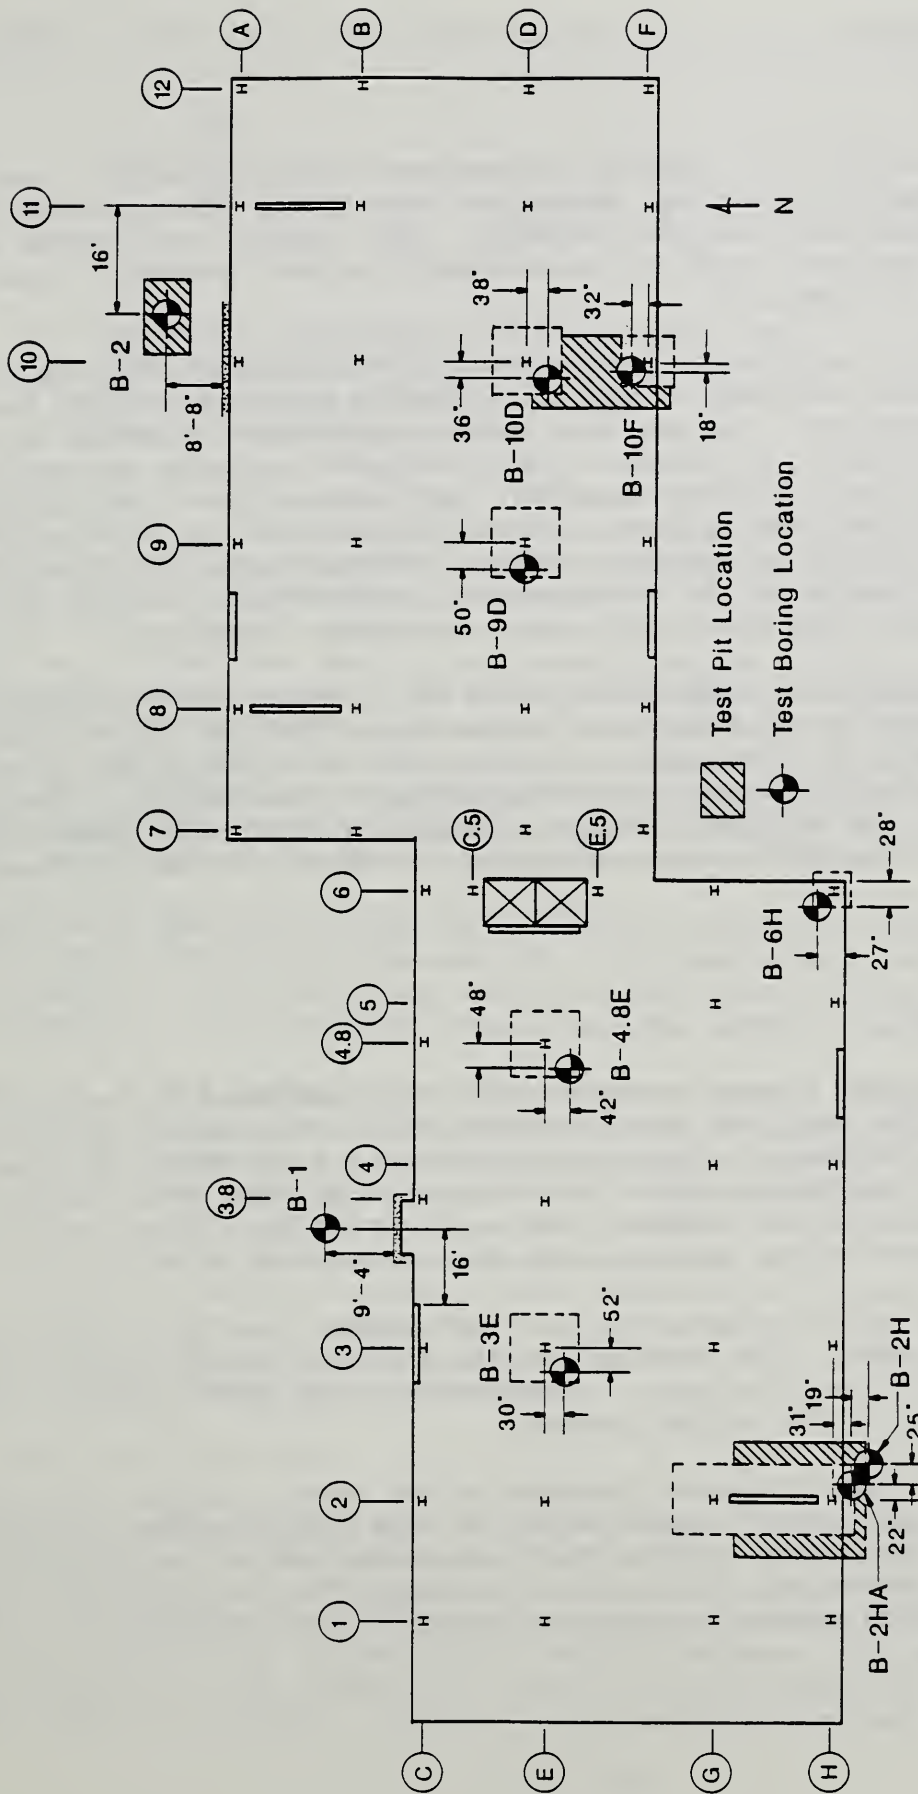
Location of soil borings and test pits for subsurface exploration
